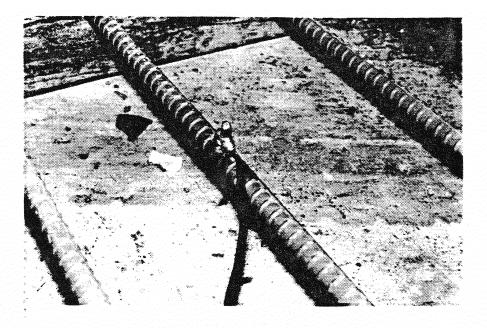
Copper Wires Welded to Reinforcing Bar
